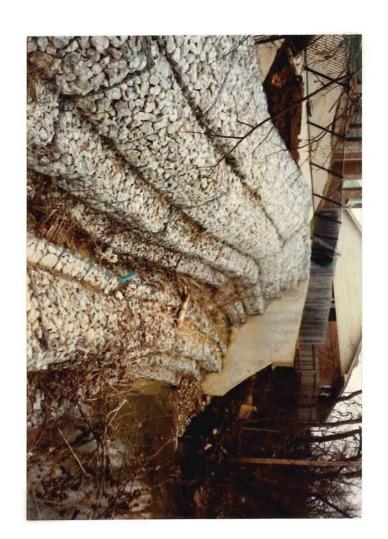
Completed gabion section prior to 1991 pointed west towards residential Lot A. flood. Camera
